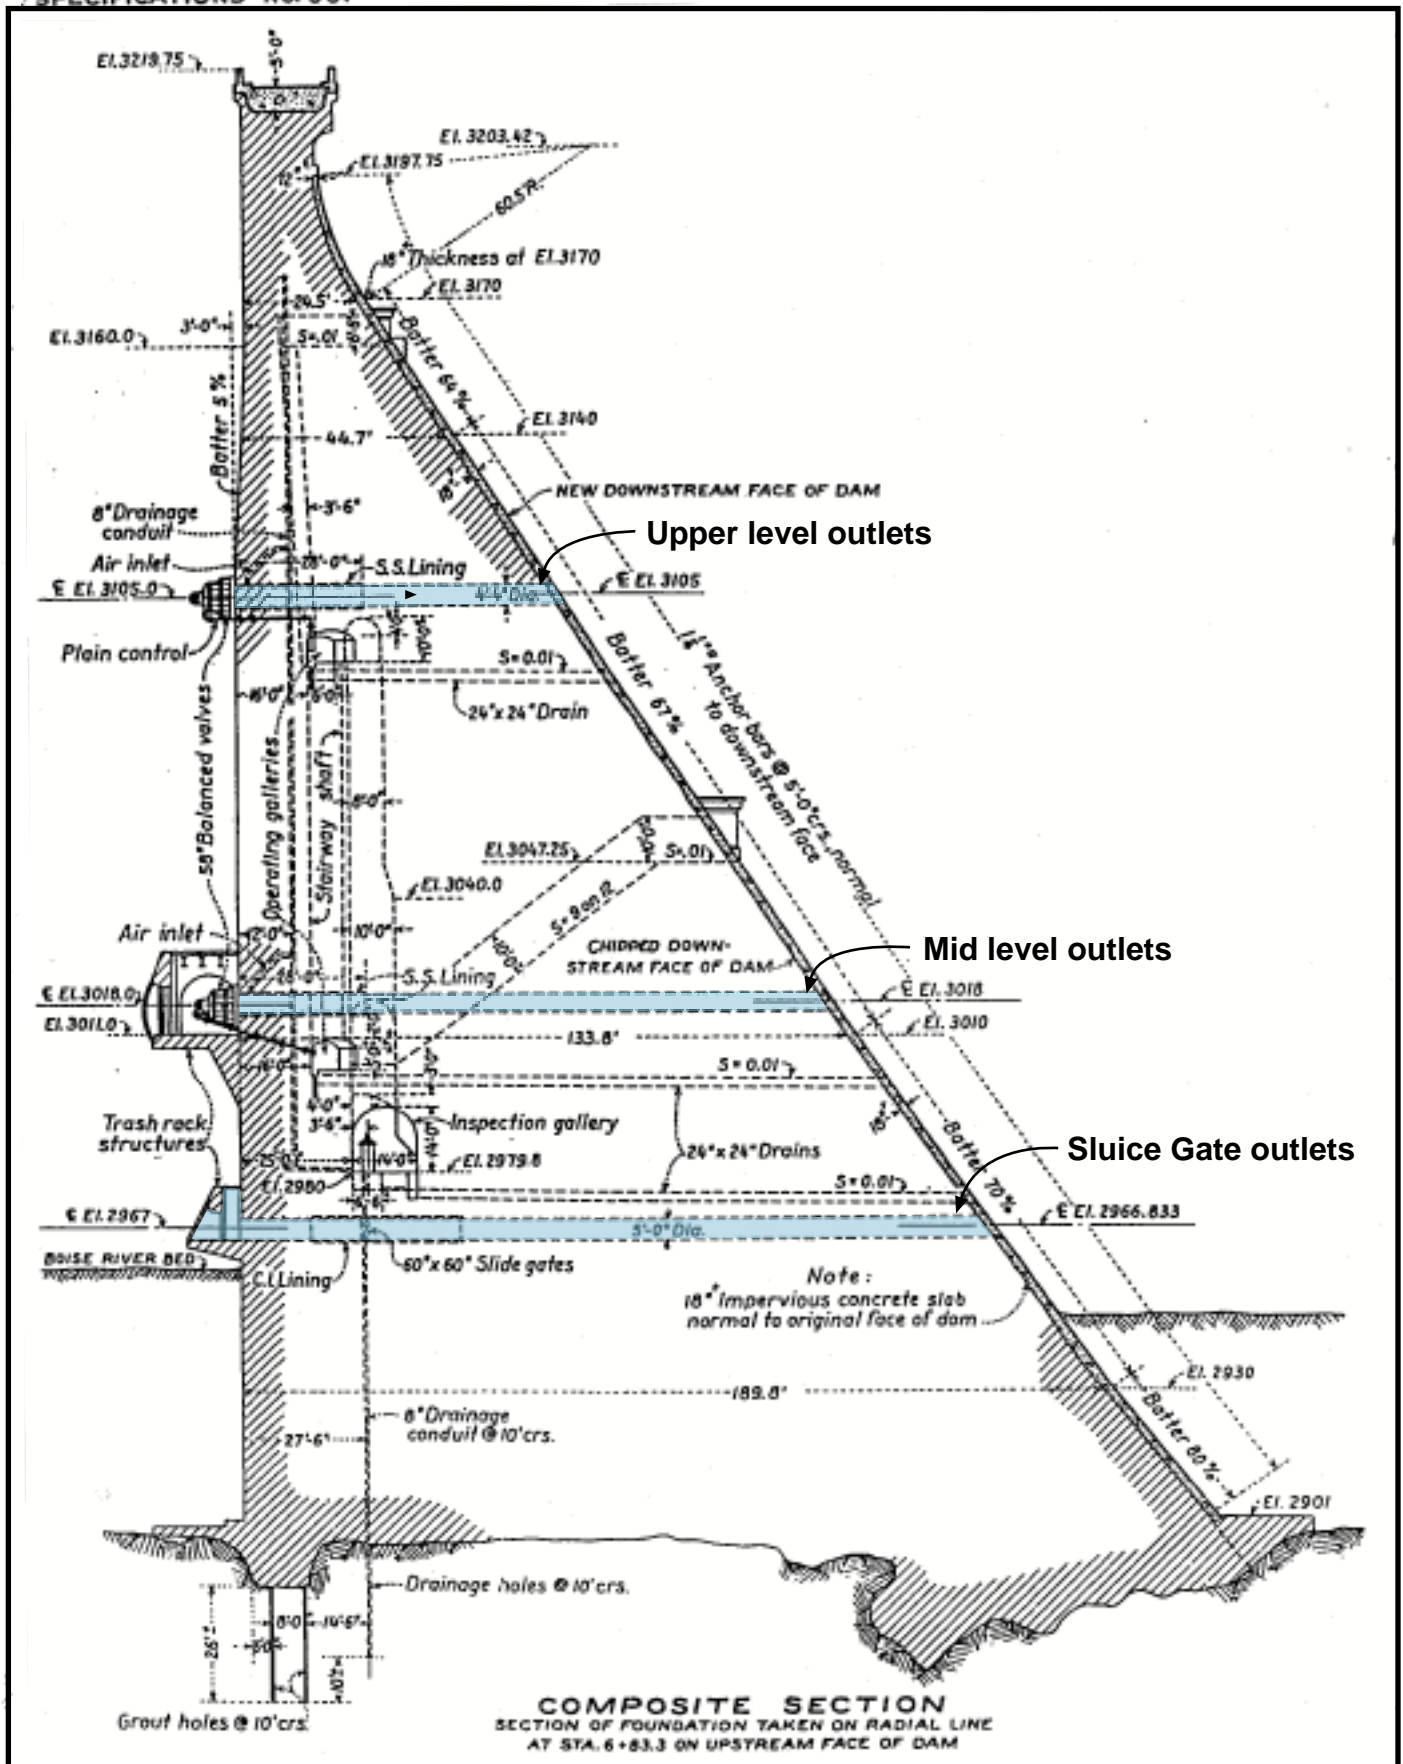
Cross-section of Arrowrock Dam from original design drawings.
